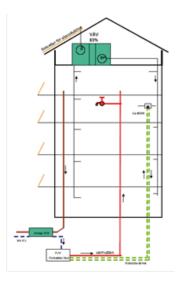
Sketch of the planed passive house apartment building Southern Portvakten
